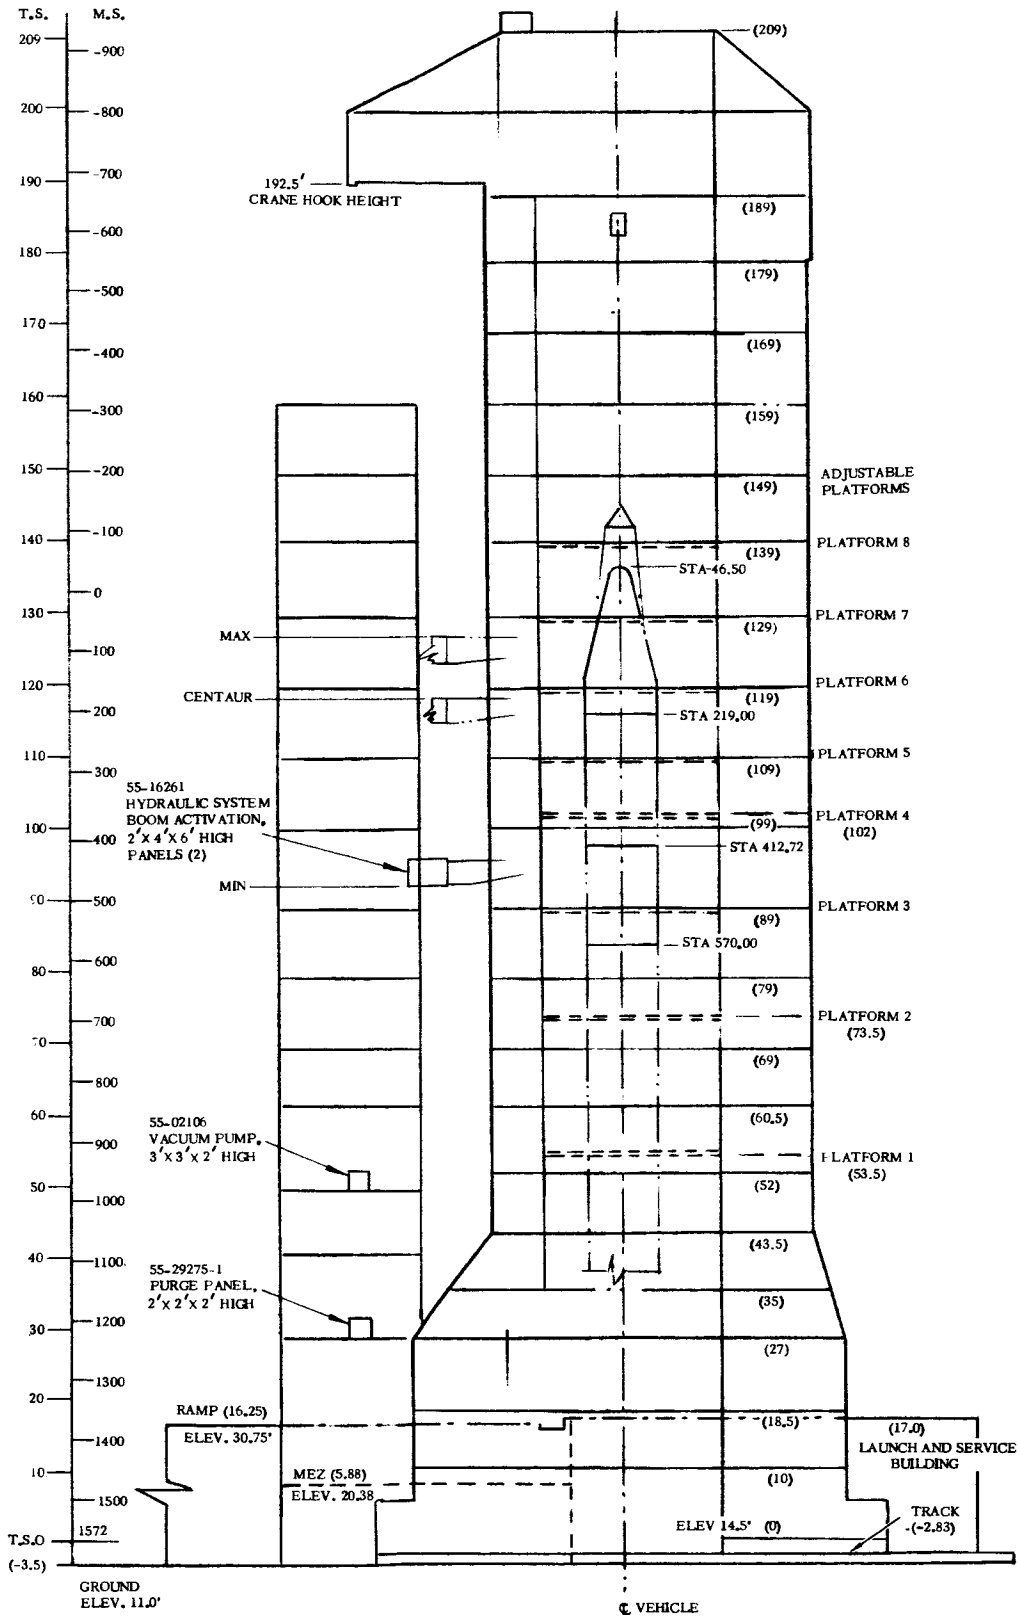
East Elevation - Service and Umbilical Towers
